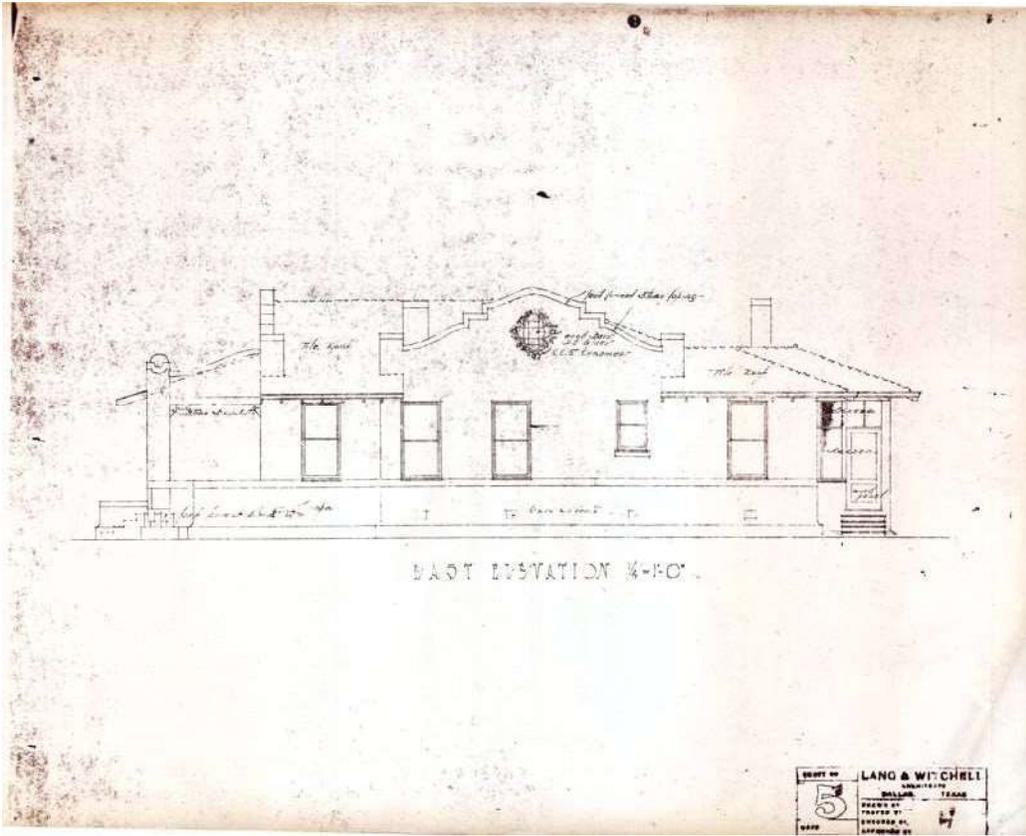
Original Lang and Witchell Side (Northeast) Elevation – Sheet 5
